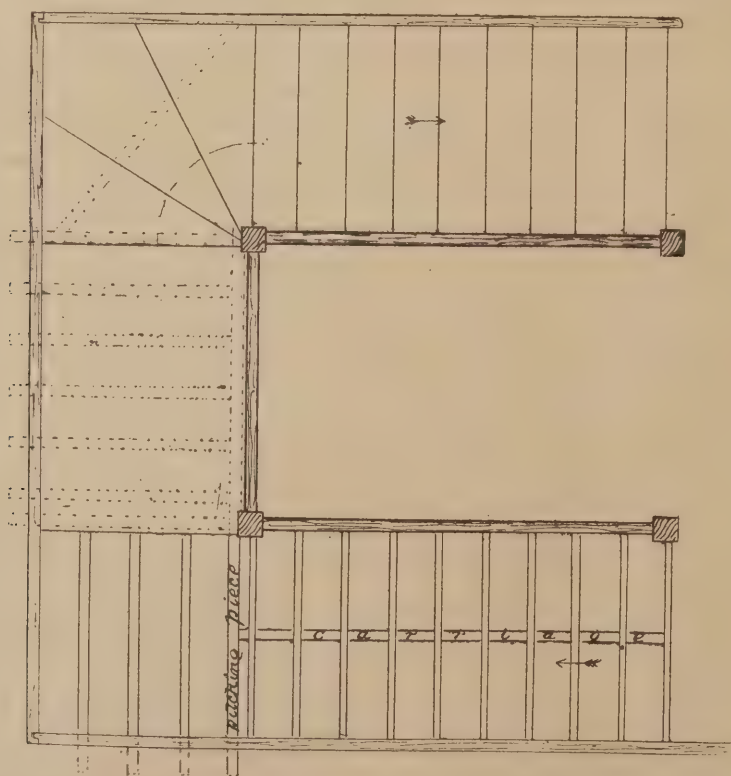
PLAN OPEN NEWELLED STAIRS.
